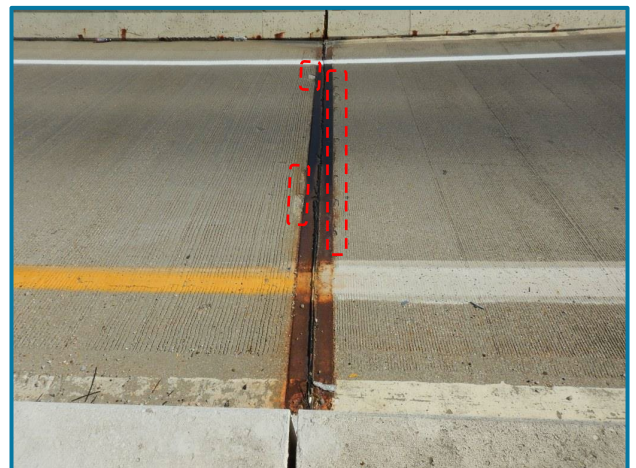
Shallow spalls along the joint at Pier 1 and missing/deteriorated compression seals (Pier 1, Spans 1-2, looking east).
